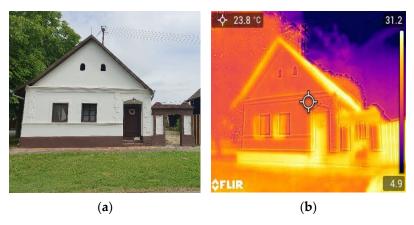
A traditional house in Bijelo Brdo, constructed from rammed earth. (a) A photo of the front elevation of the house; (b) a thermovision image of the house facade.
